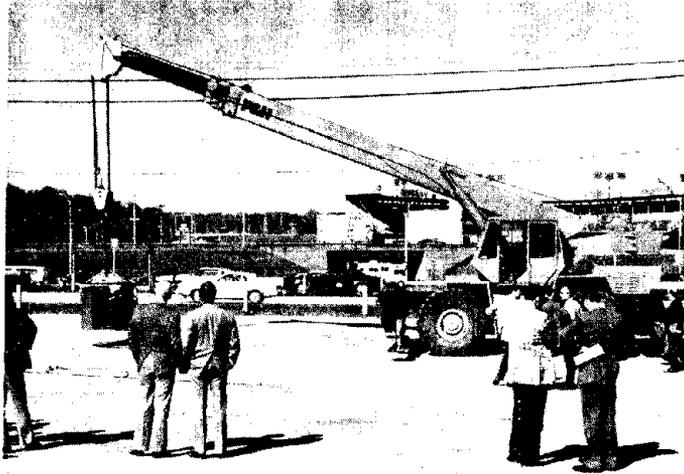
Crane with outriggers raised and lifting cement bucket
